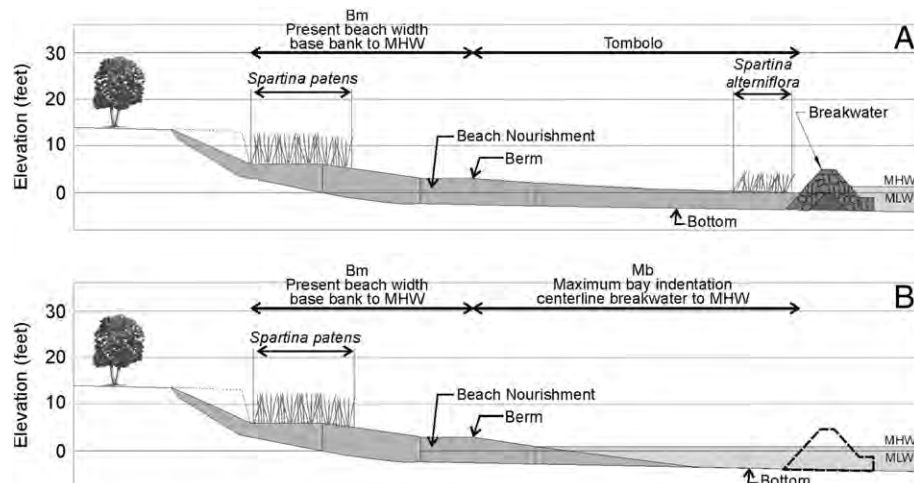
Typical cross-section of A) Breakwater beach and B) Bay beach (from Hardaway and Gunn, 2000).
